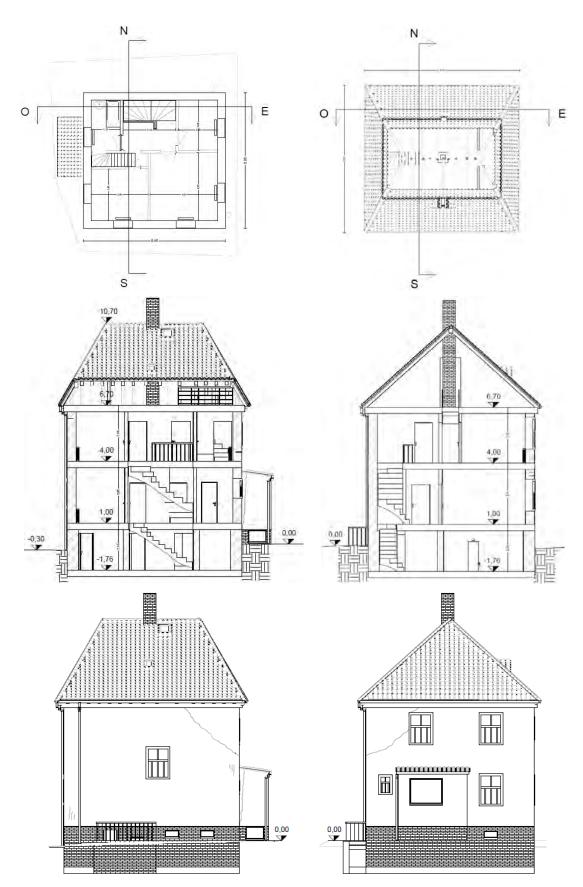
Plans (up), sections (middle) and prospects (down) of the building exported by the software Revit
